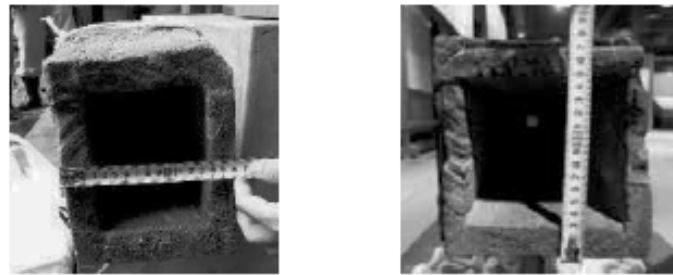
Wooden pipe section in Tatsumi Cana (left) and Kanda Aqueduct (right)
